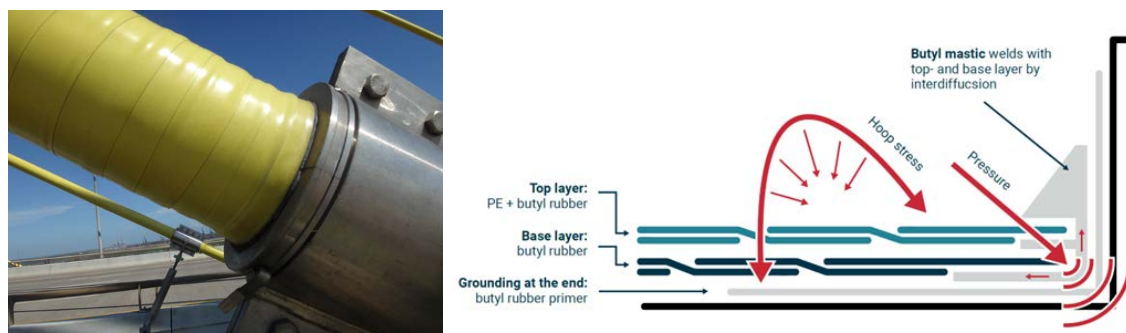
Wrapping of connection points such as anchor zones, cable dampers or hanger clamps. Left: Example of butyl rubber system ATIS Cableskin<sup>®</sup> wrapped to a cable damper clamp at Fred Hartman Bridge, Texas, US, 2015. Right: Schematic view of wrapping to a connection point.
